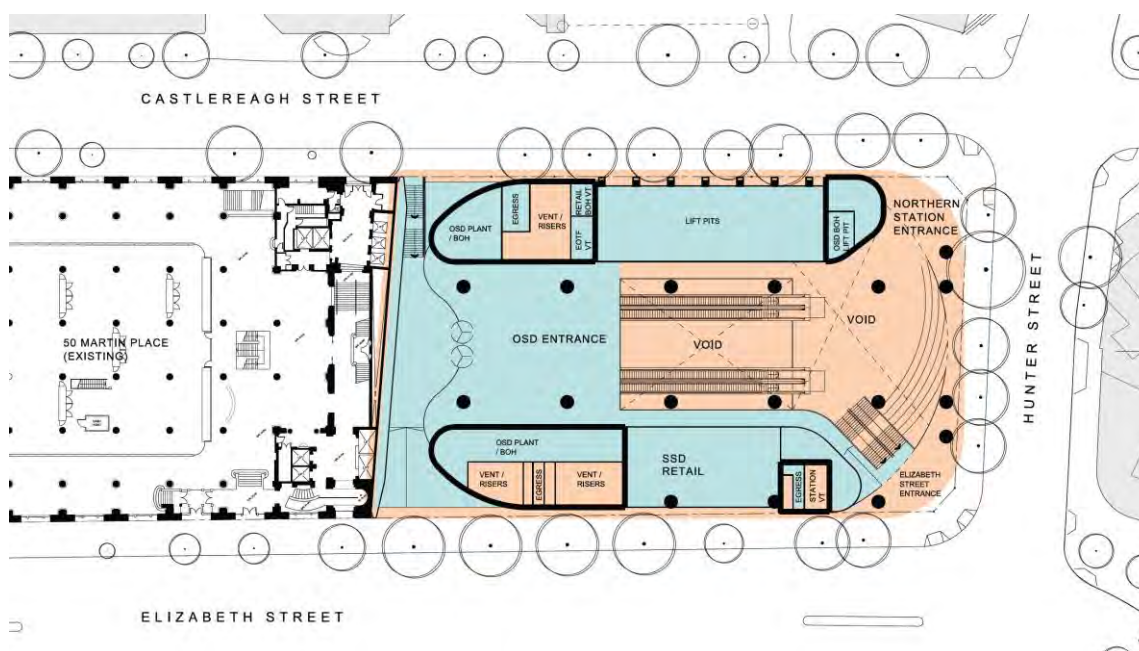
Ground floor CSSI / SSD Demarcation Plan, North Site
